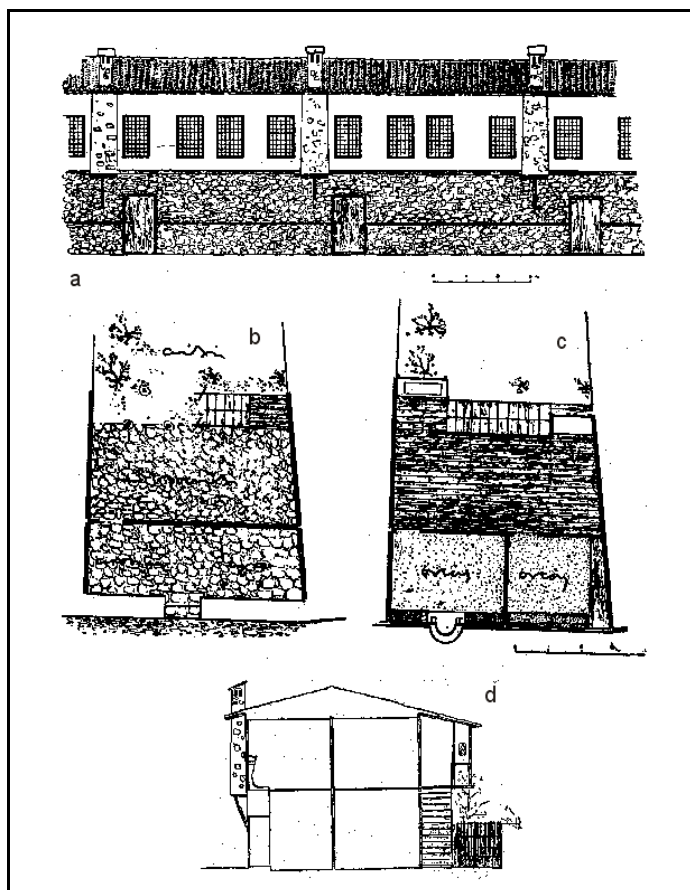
The *laika* houses of Veroia, a. façade, b. ground floor, c. first floor, d. section (Chrysopoulos 1960: 287-288, fig. 1, 2, 3).
